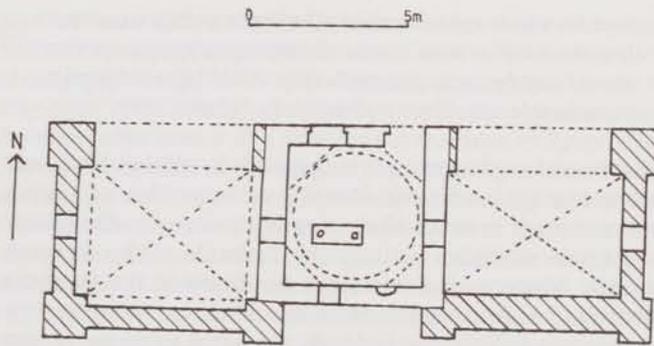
Ascalon (No. 13). Plan of Shaykh 'Awaḍ.
